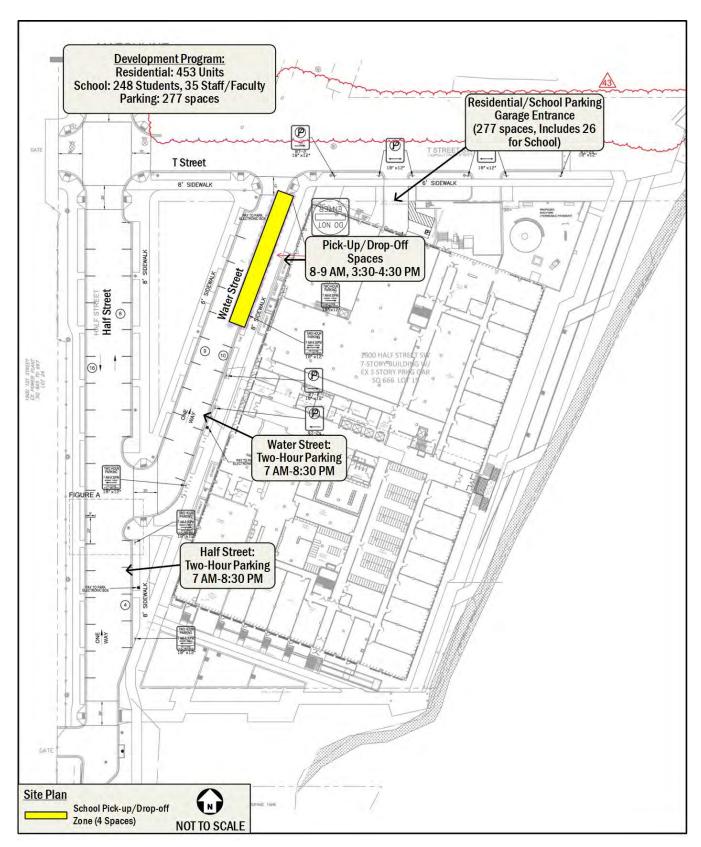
Site Plan - 1900 Half Street - Eagle Academy
